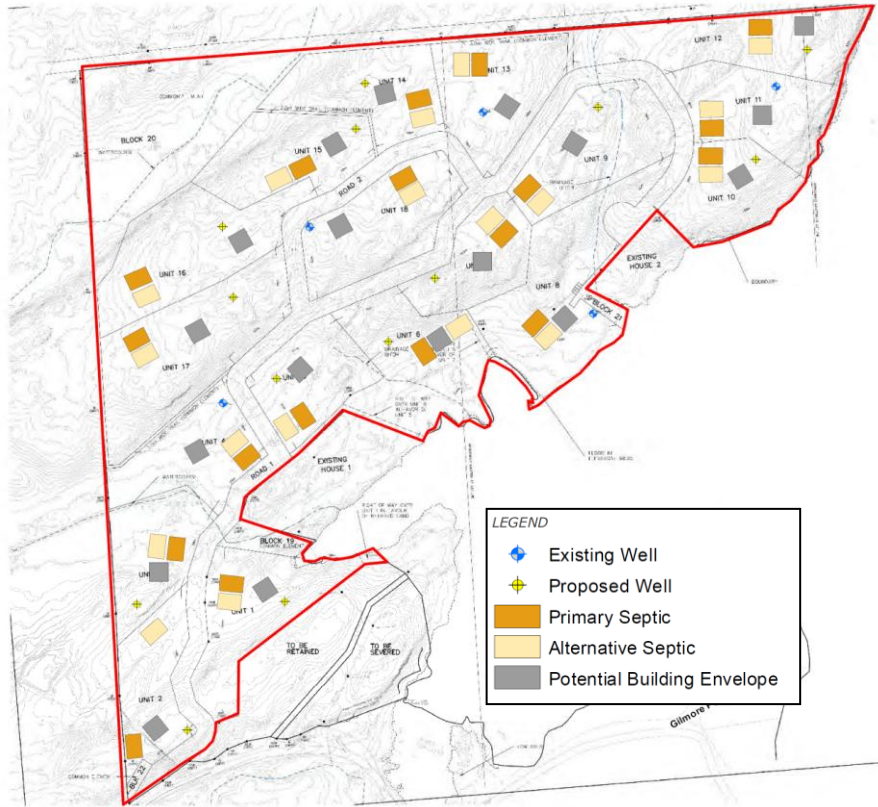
PROPOSED BUILDING, WELL AND SEPTIC LOCATIONS
